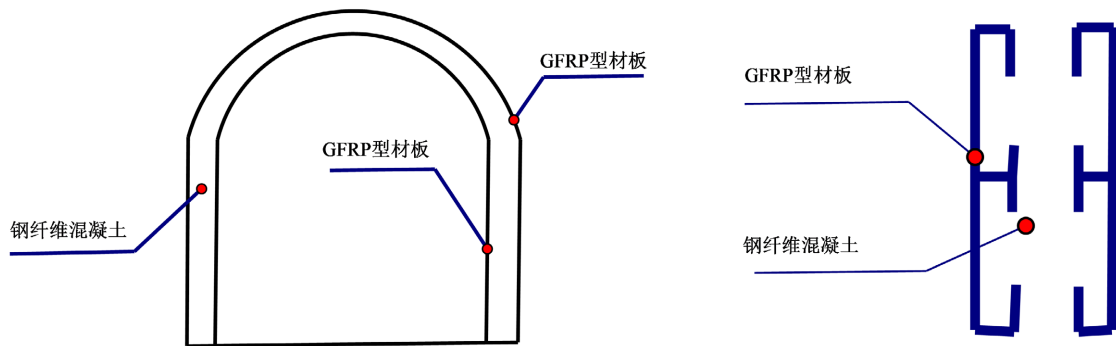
Structural diagram of GFRP-steel fiber reinforced concrete composite lining
